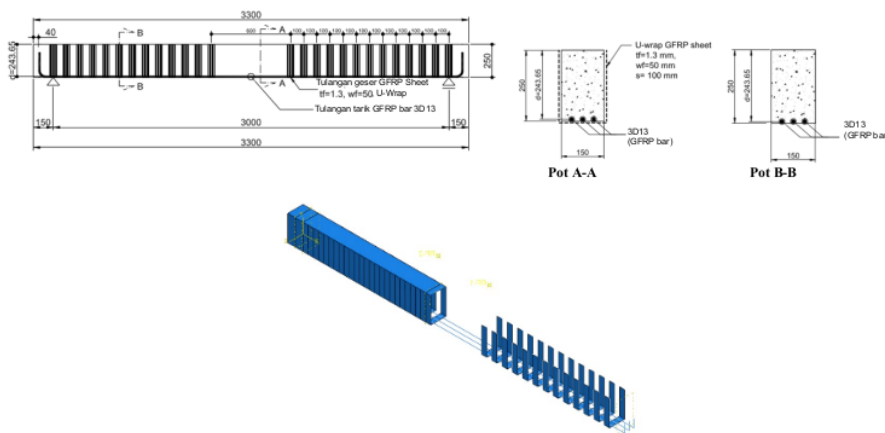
Modeling scheme of fiber beam without cover concrete (BFTS).
